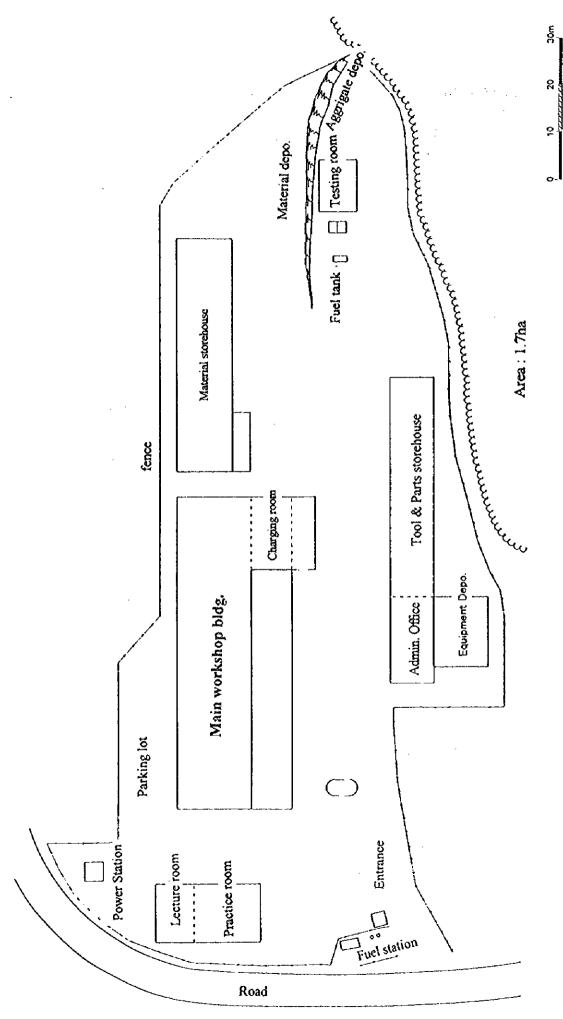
LAYOUT OF SHEFA SUBDIVISION WORKSHOP
